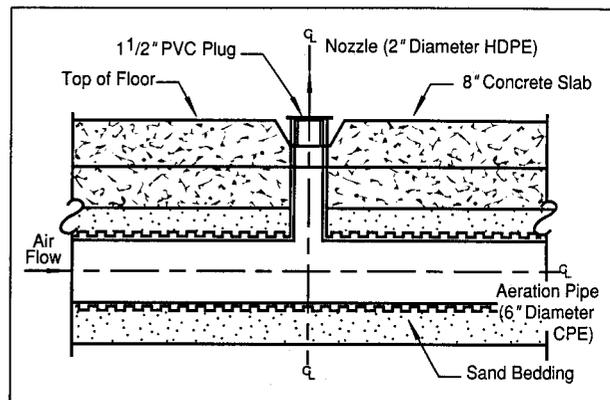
Cross section drawing of the in-floor aeration nozzle. The active compost floor has more than 900 such nozzles.
